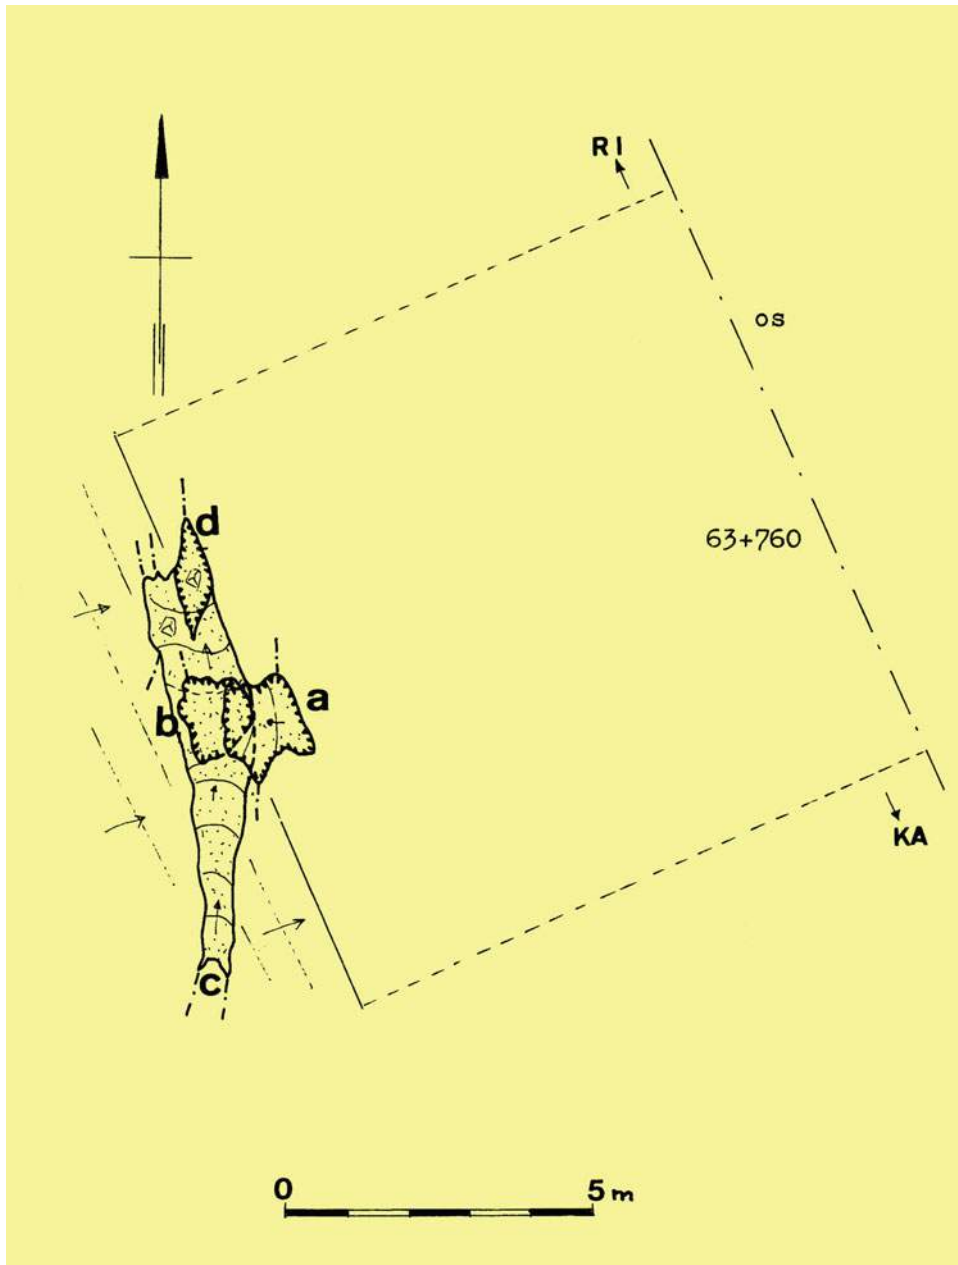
Plan of cavern at km 63 + 760 on A-6 highway, Kupjak—Vrbovsko section
